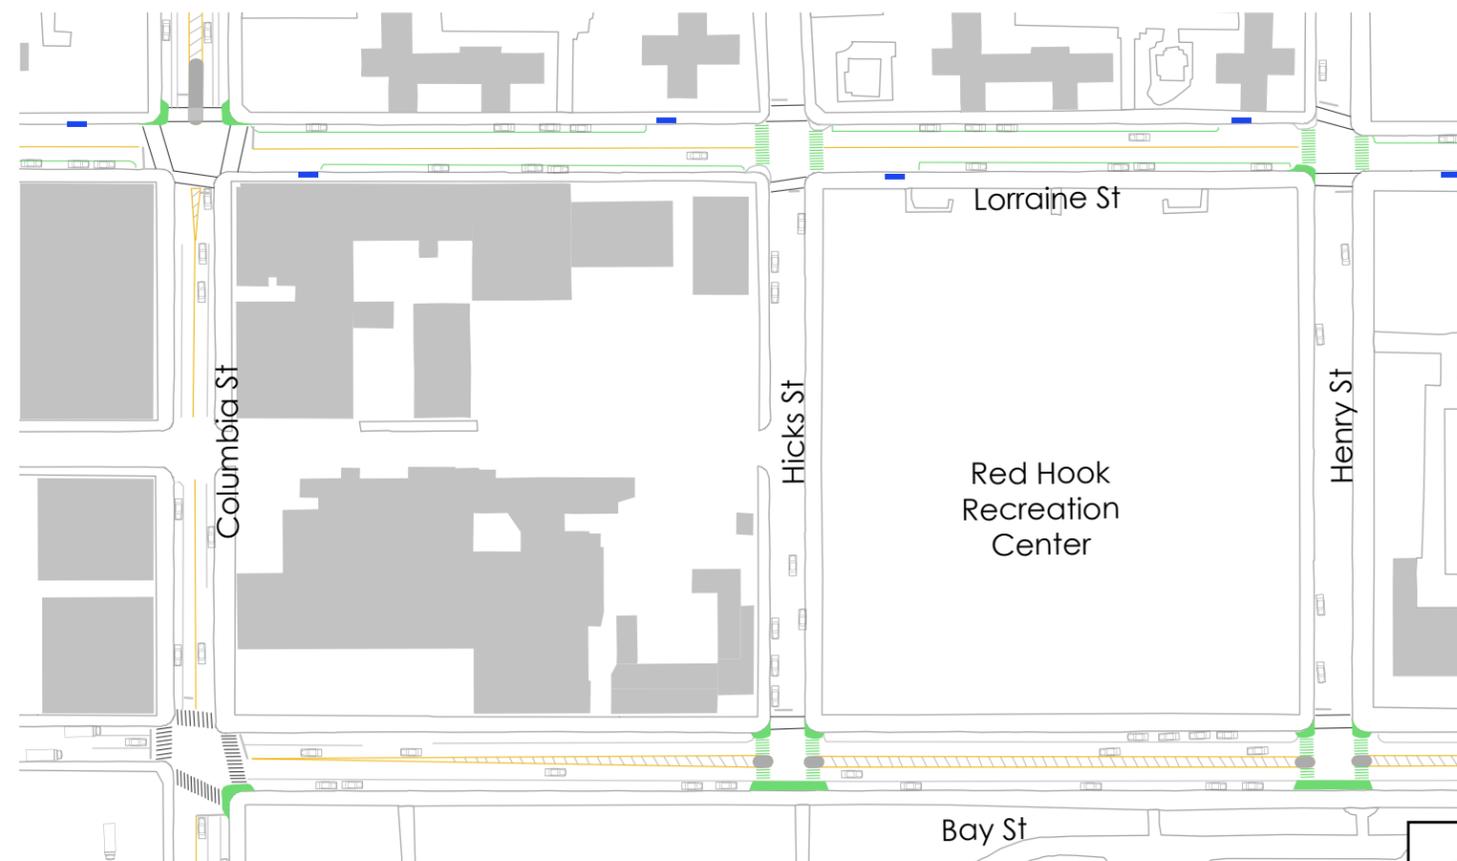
Recommendations for improving Lorraine and Bay streets; crosswalks, striping parking and travel lanes, installing bulb-outs and green infrastructure i.e. bioswales
